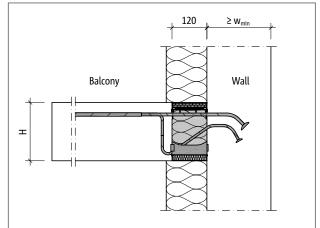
Schöck Isokorb® XT type K-O: Wall connection downwards with external insulation
